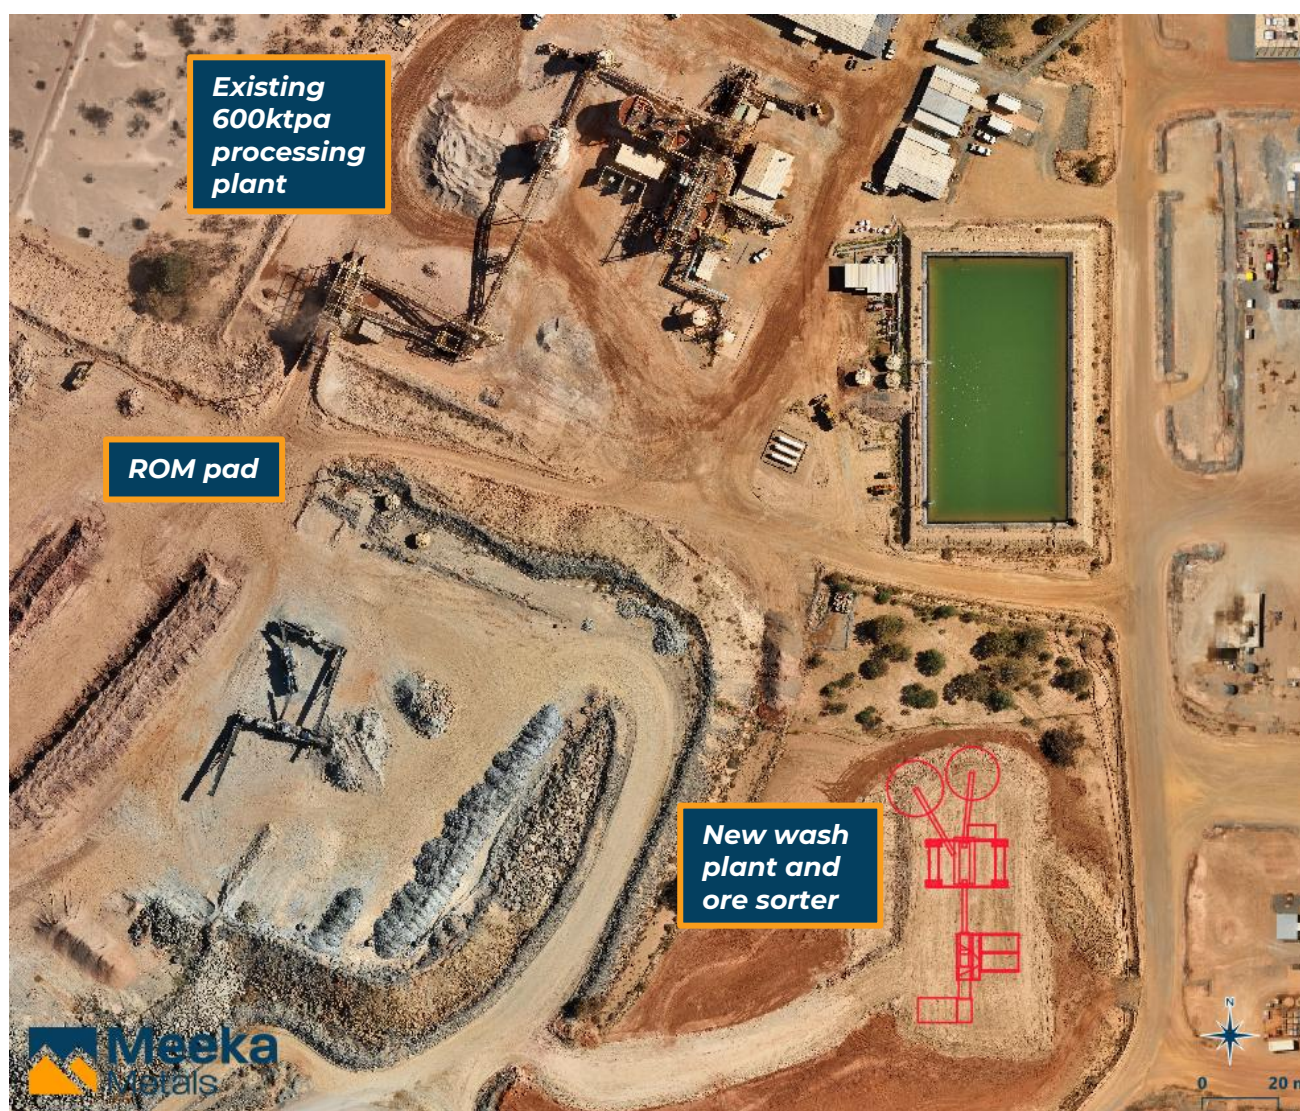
Plan showing new wash plant and ore sorting facility, and existing processing infrastructure.
